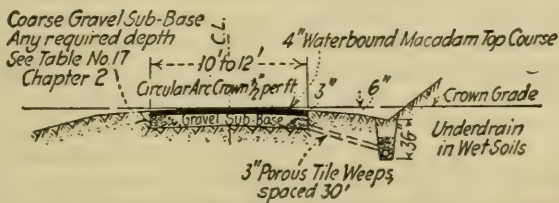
B.—Recommended waterbound macadam pavement section gravel foundation Class IV traffic.
